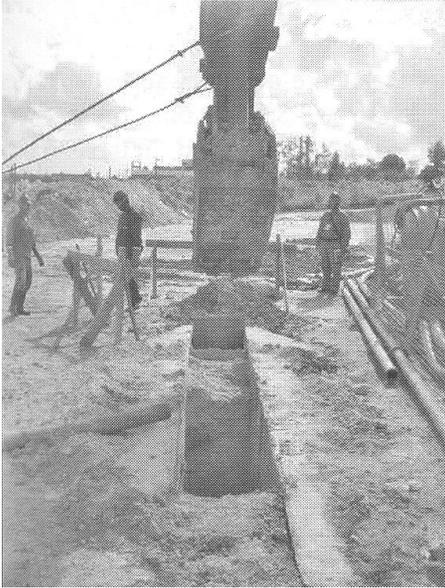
Excavation of trench and placement of soil-bentonite backfill.
